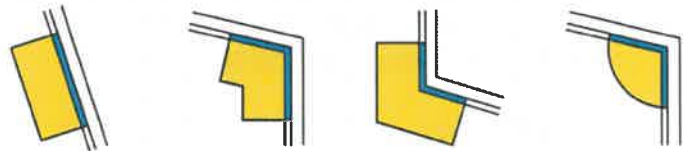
Shapes for prefabricated concrete balconies and loggias from SCANBET
